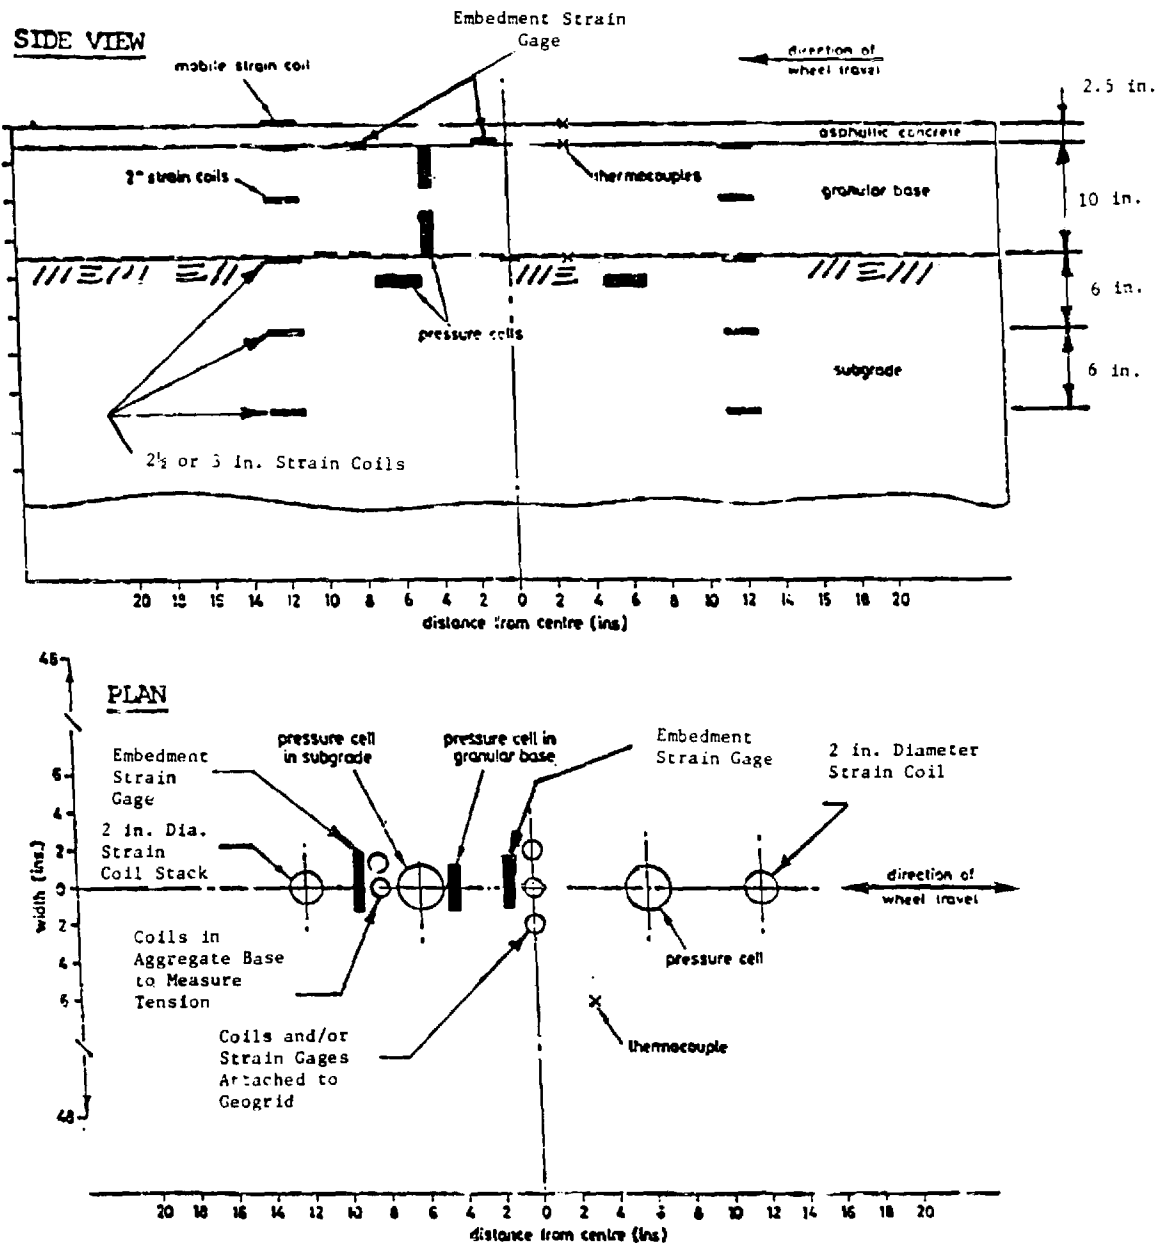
Preliminary Instrument Plan for Each Test Section.
